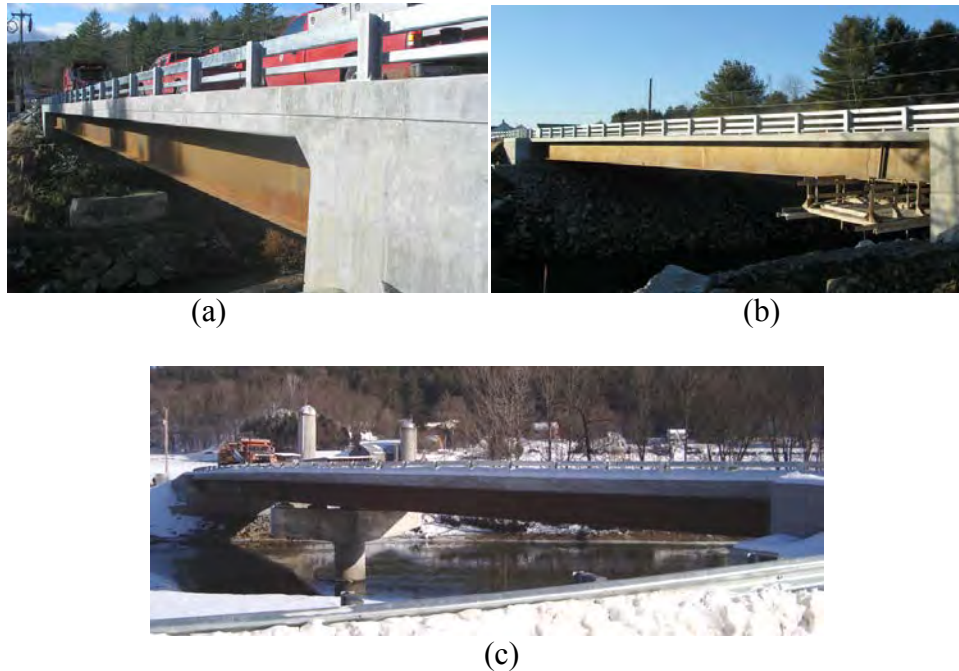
Final Structures (a) the Middlesex Bridge (b) the East Montpelier Bridge (c) the Stockbridge Bridge
